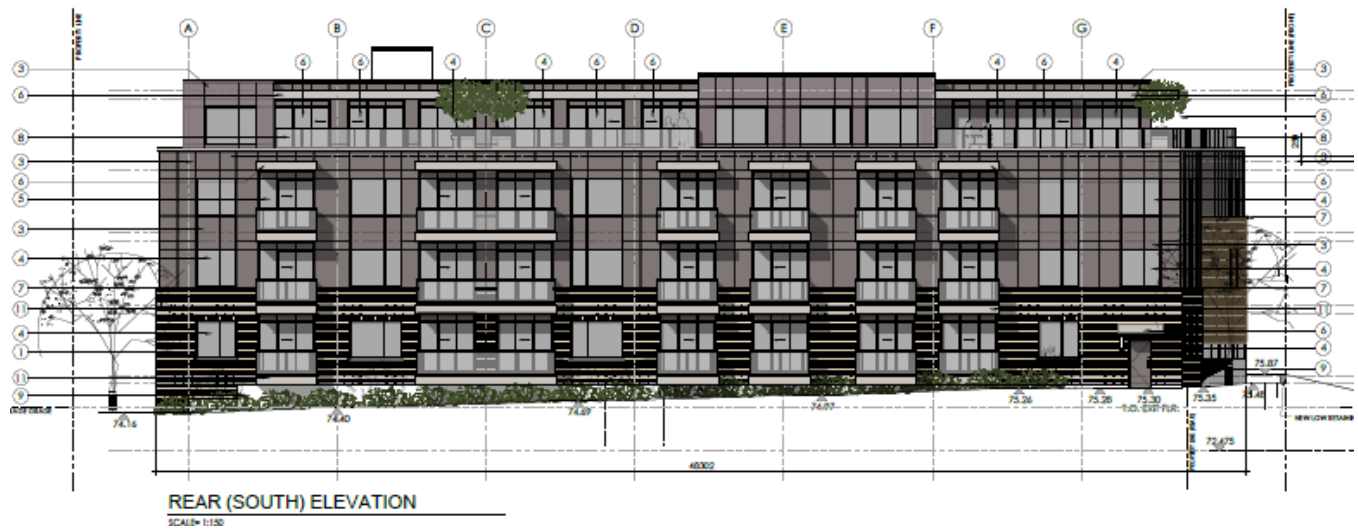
South elevation of the proposed development, prepared by M. David Blakely Architect.
